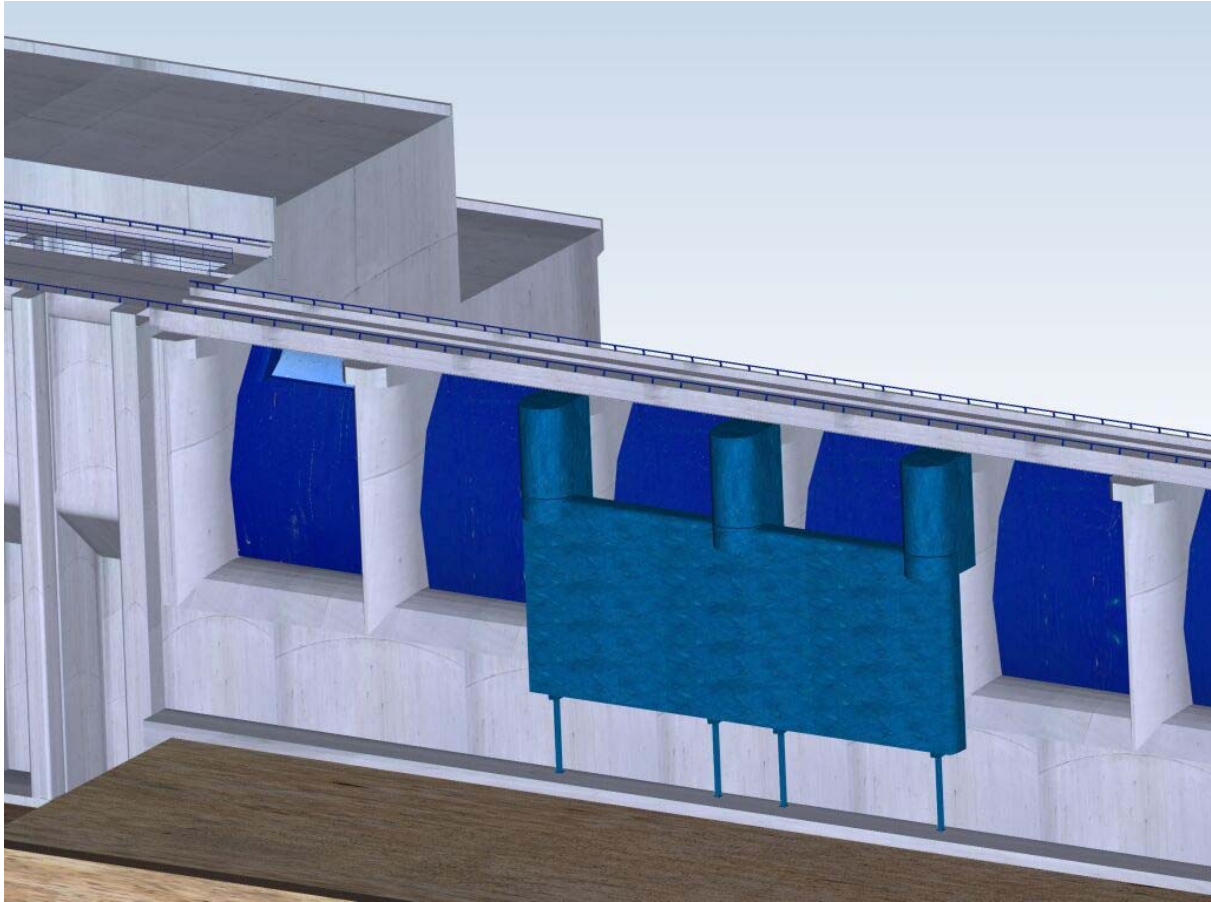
Conceptual drawing of Priest Rapids top-spill bulkhead looking downstream. Spillbay 21 is to the left of the bulkhead.
